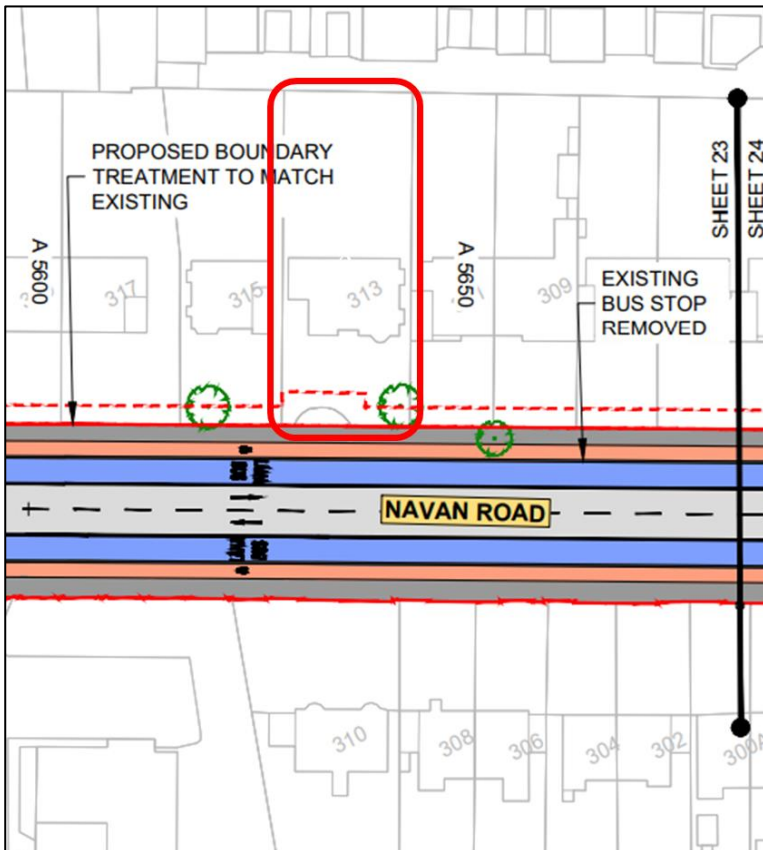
Proposed new Layout at 313 Navan Road
